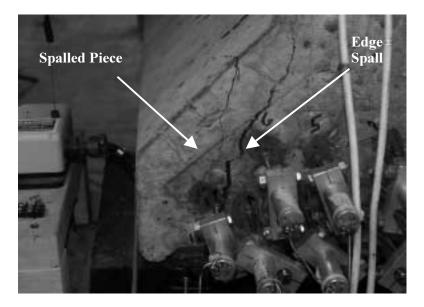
Support Spall at End (LW8000-2-N-70)
